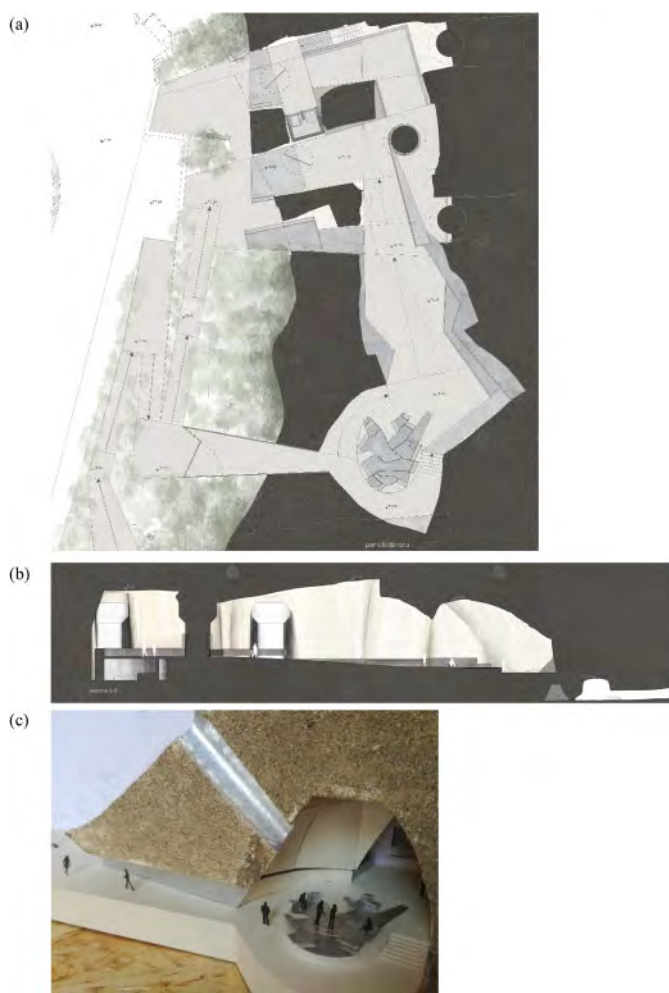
(a) Plan, (b) section and (c) detail of the renovation project.
